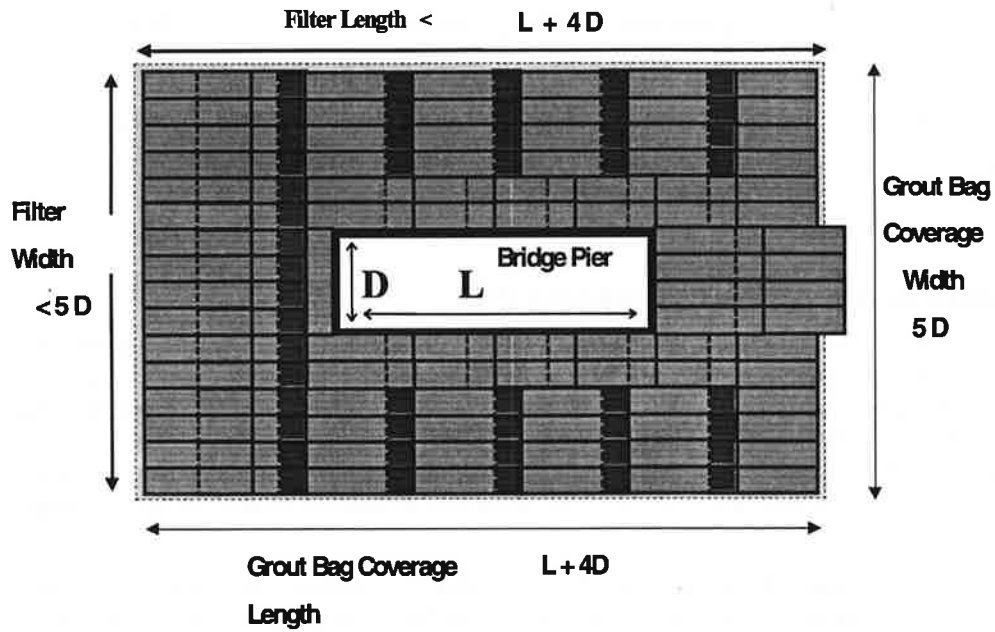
Grout filled bag and geotextile cover. In the event that the attack angle β exceeds 15° the installation follows the guidelines of Figure 8.6.
